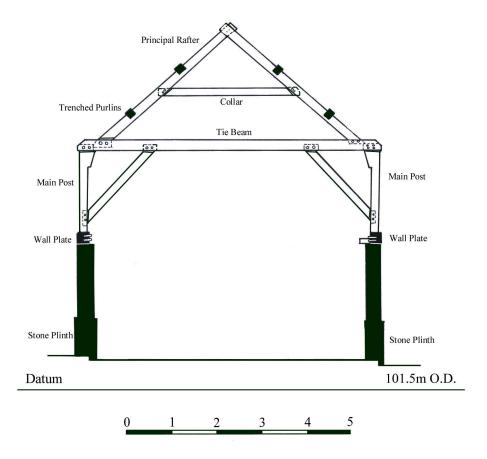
Section K-L. An example of one of the truss frames in the stable. This truss type, with the jowled stops on the post and struts from post to tie-beam, became increasingly common in the 16<sup>th</sup>/17<sup>th</sup> centuries.
